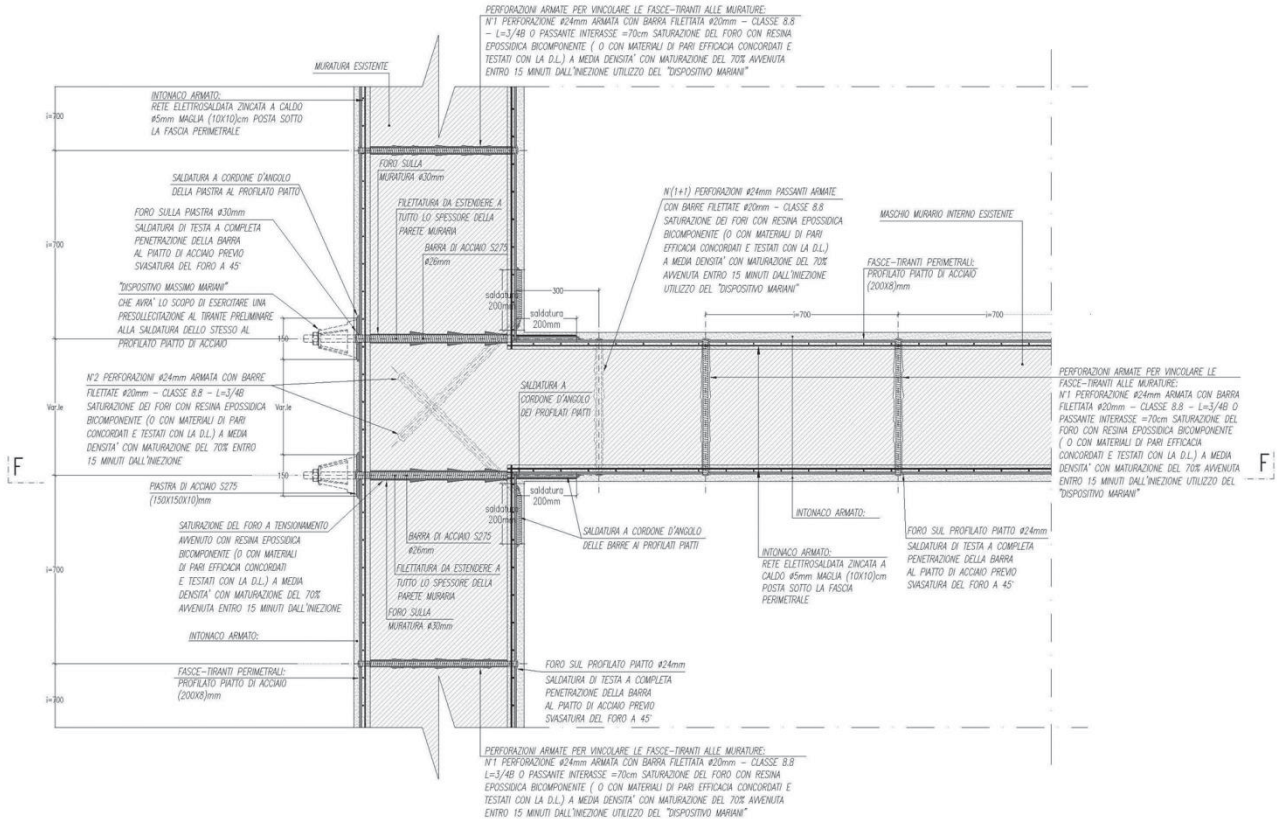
Horizontal connection between orthogonal masonry piers in presence of reinforced mortar on both faces and internal wrapping with steel plates connected to masonry through the “Dispositivo Massimo Mariani”, a device allowing to manually prestress the connection jacks in order to enhance the collaboration between steel plate and masonry structure. Prestress is exerted through torque wrench; ties and steel plate are fully covered by the mortar (original drawings by Massimo Mariani)
